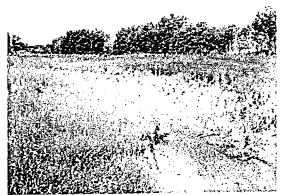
Looking northwest at erosion through bean field from culvert on SW Gary Ormsby Dr.
